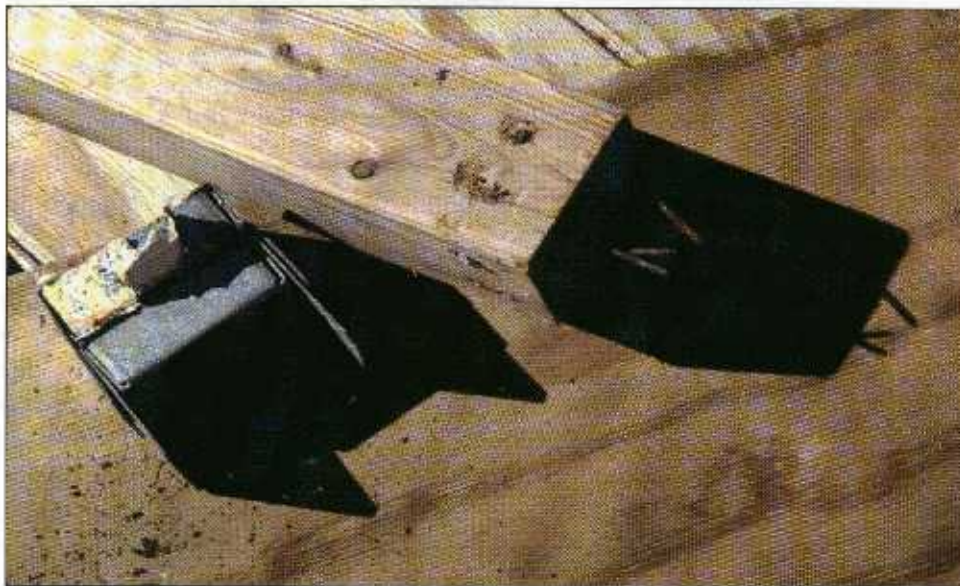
Wood wall column that failed at connection to sill plate. This building was only two months old but was only partially constructed with clips, straps, and fasteners. The proper column fastener in the photograph was found unused beneath the house. This column was from the same house presented in Figure 3-13.
